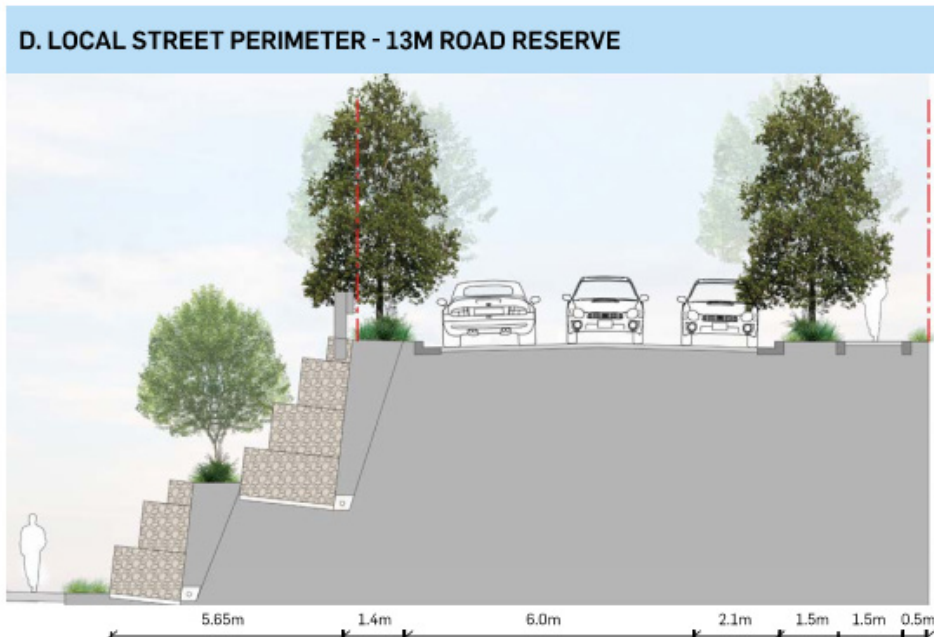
D - Local Street Perimeter - 13m Road Reserve
